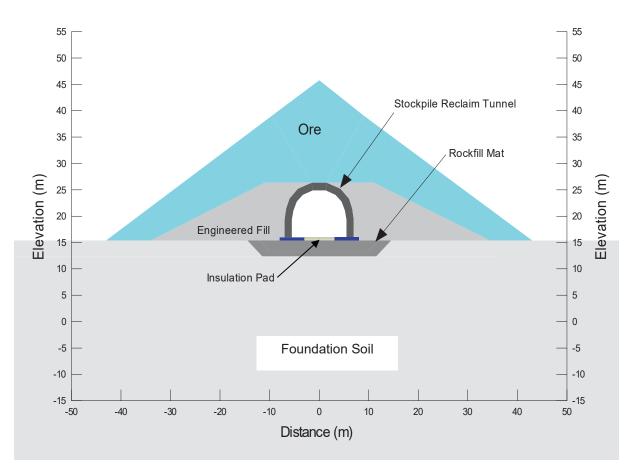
Illustration of Stockpile Reclaim Tunnel
